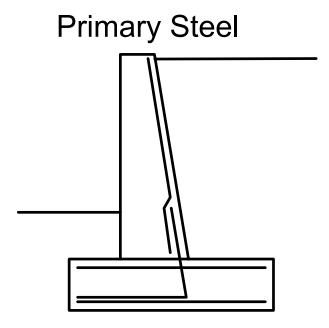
Primary Reinforcing Steel in Concrete Cantilever Wingwall
